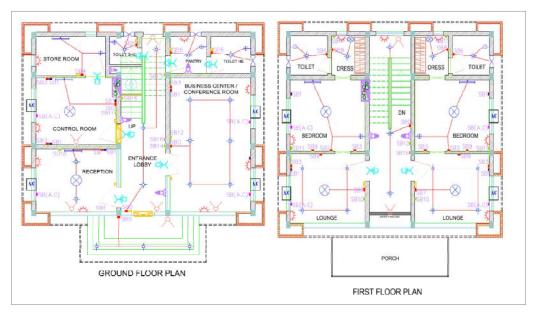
Ground & First Floor Plans of the Proposed Intelligent Building
